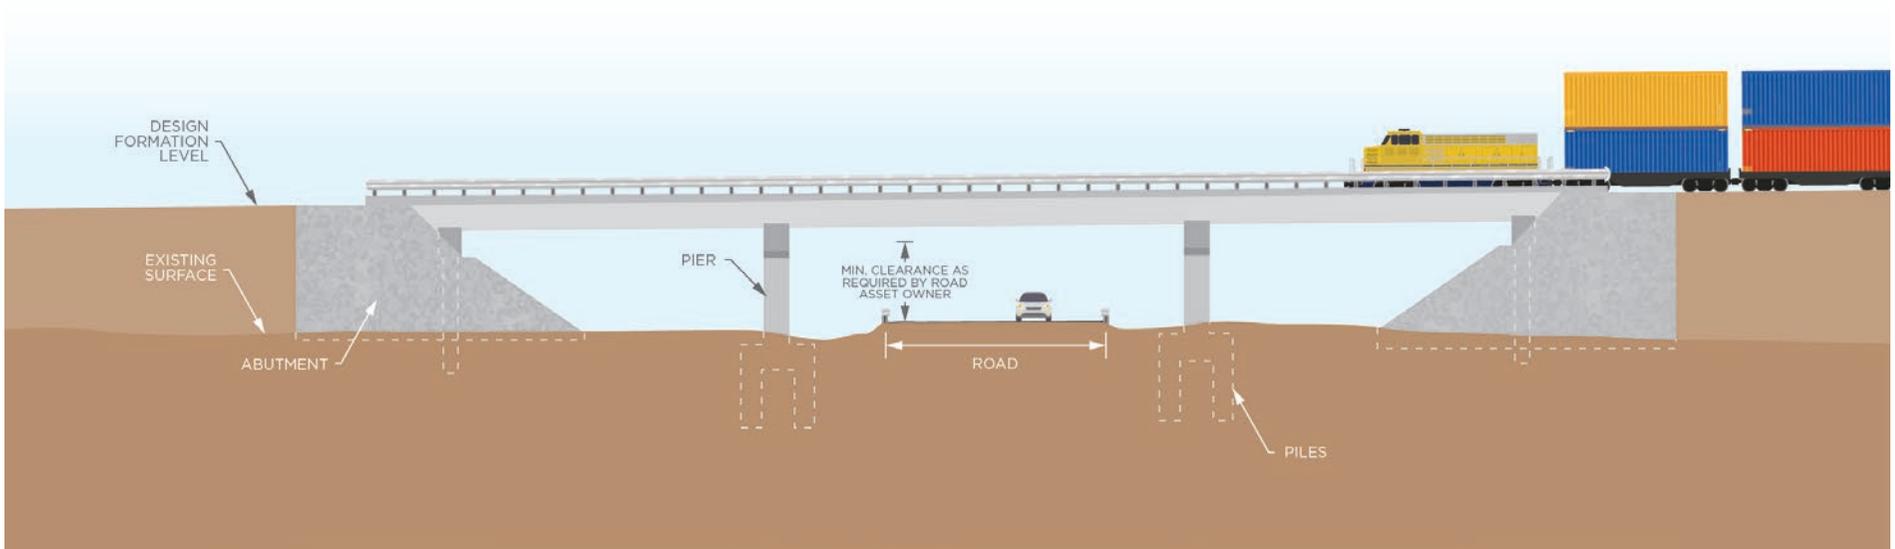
TYPICAL SECTION OF RAIL OVER ROAD BRIDGE STRUCTURE
